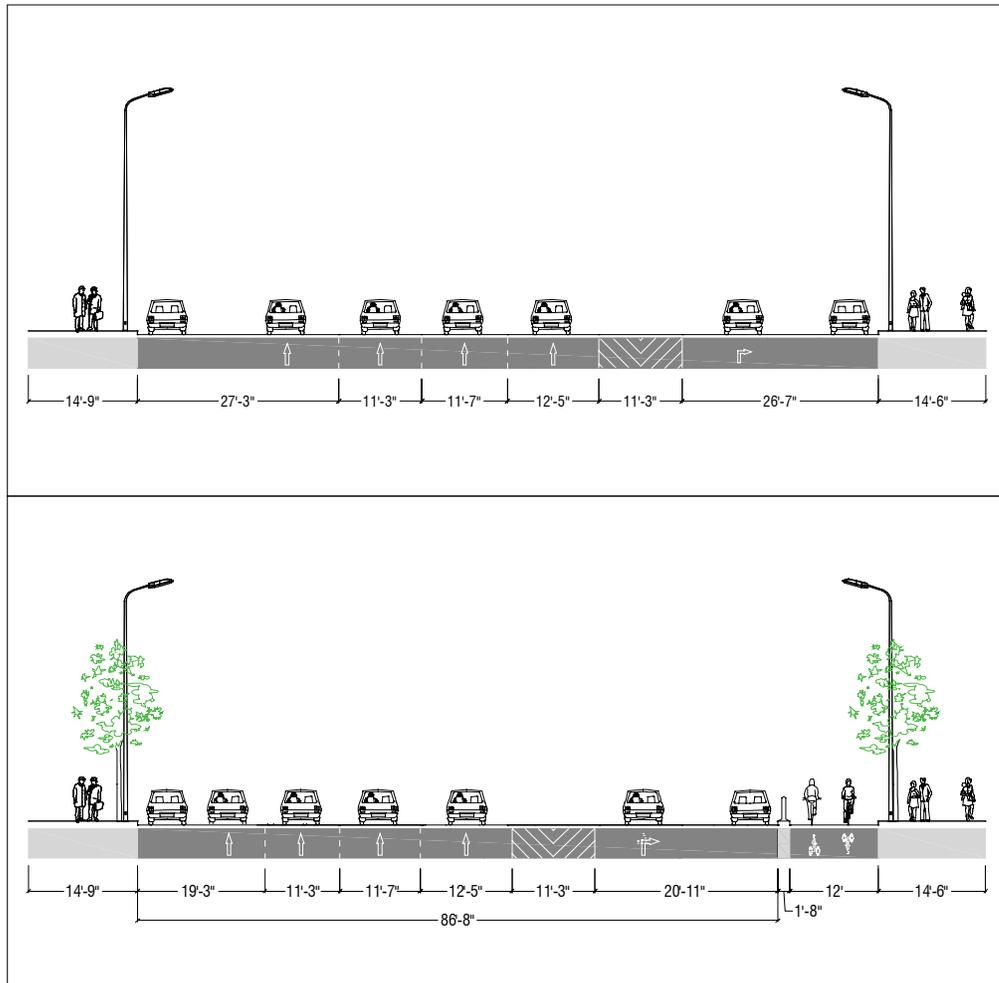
3<sup>rd</sup> Avenue between East 136<sup>th</sup> Street and East 135<sup>th</sup> Street, existing and recommended cross section (facing south)
